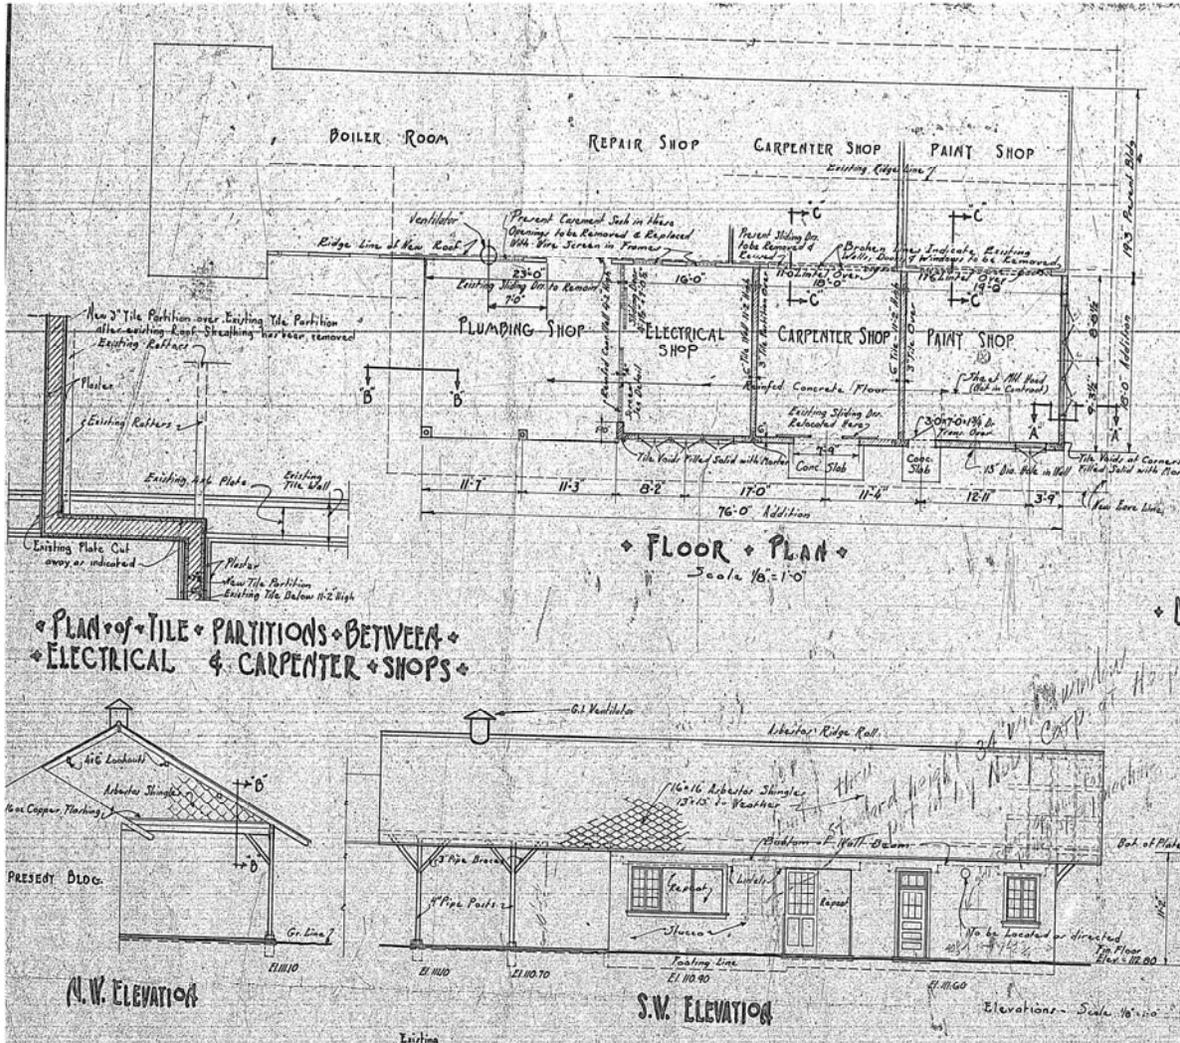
Floor Plan and Exterior Elevation (Not to scale)
